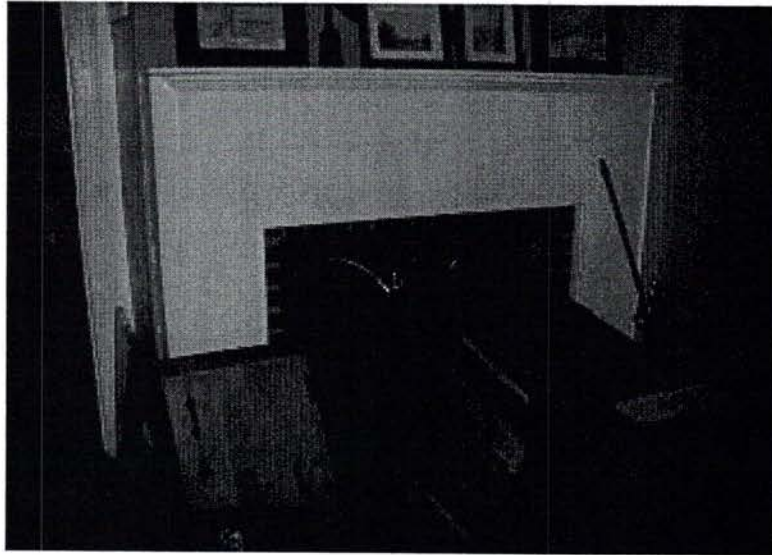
The fireplace along the western wall of Room 105 is a replacement.
